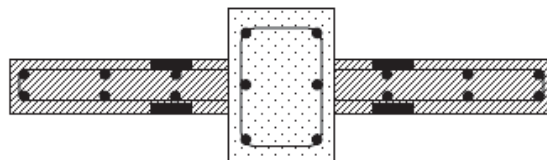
Detail of the reinforced concrete side wall type in horizontal section
